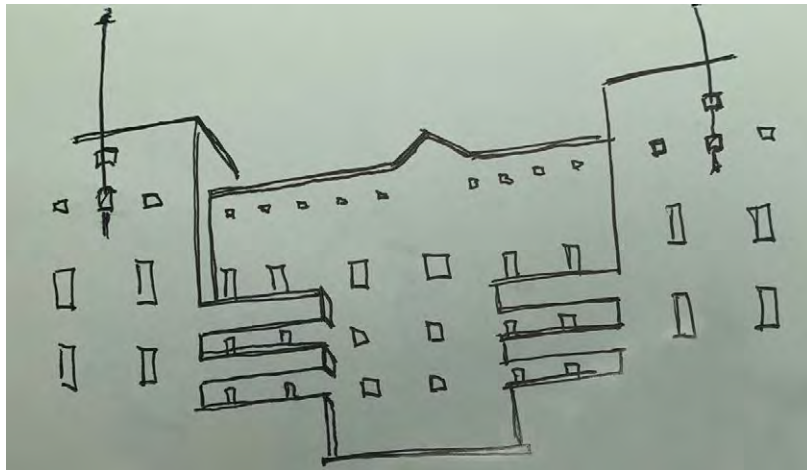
Elevation Details. Courtesy: Nat Valenza
